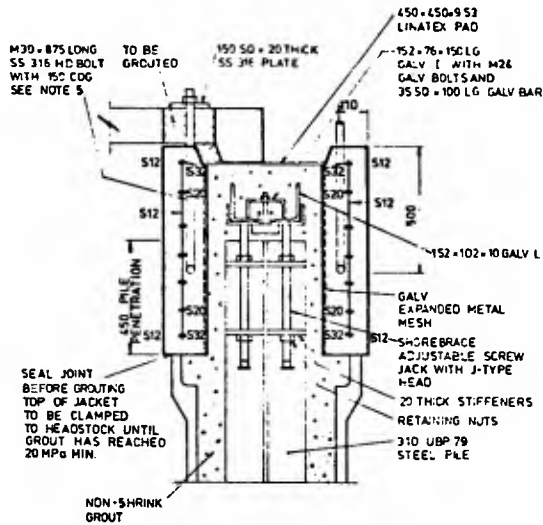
SECTION THROUGH HEADSTOCK IN PLACE
